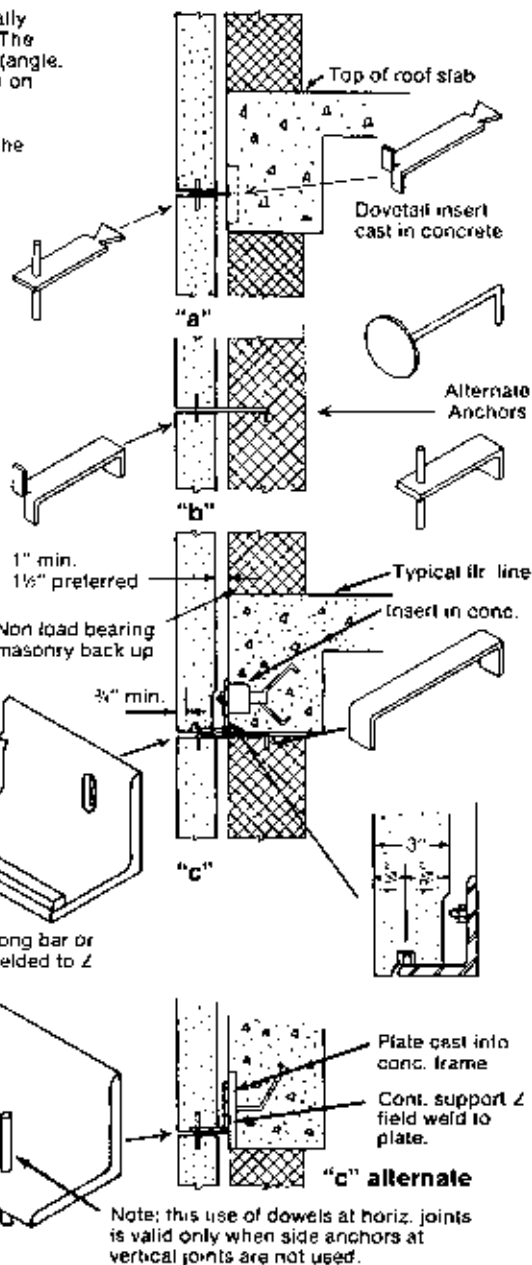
Anchorage of stone panels to multistory building. (Courtesy of Indiana Limestone Institute of America, Inc.)
